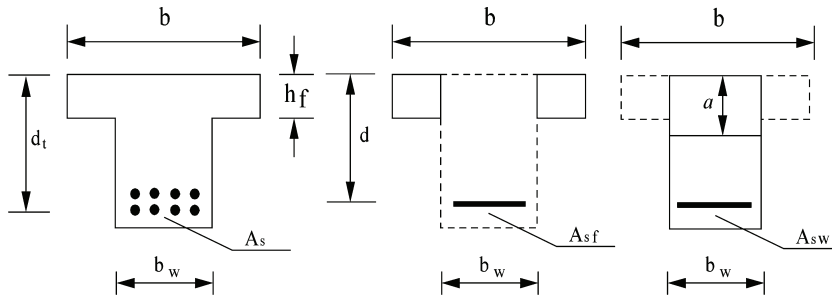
Schematic representation of stresses and strains in a typical T-beam reinforced concrete section.
